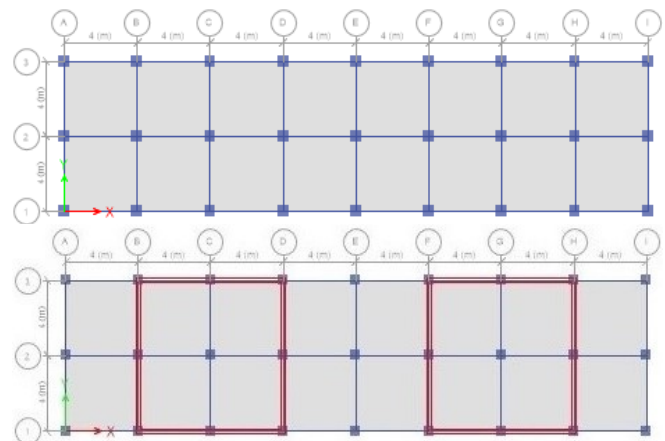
Plan of regular structure R2 representing bare frame and frame with bracings and infill walls
